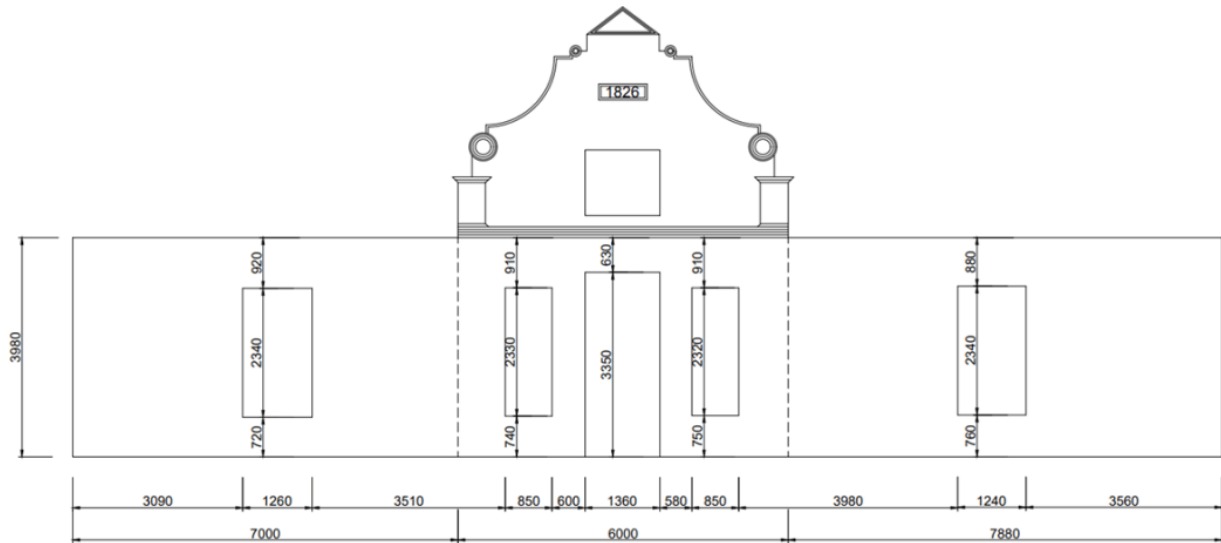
CAD drawing indicating the dimensions of the wall in mm
